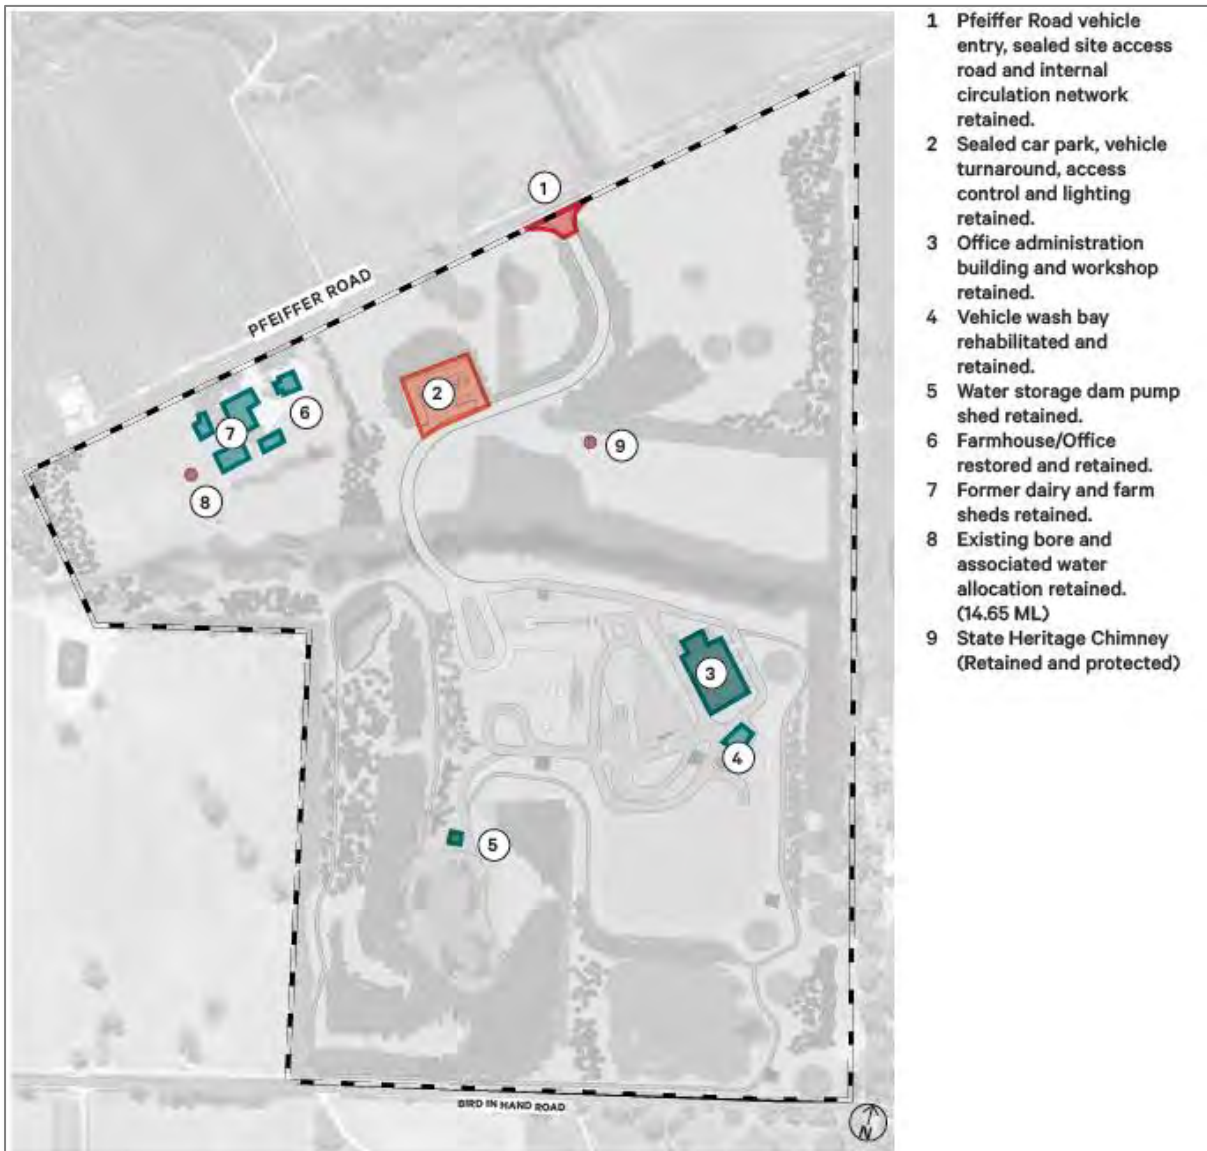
| BUILDINGS AND STRUCTURES TO REMAIN AT MINE COMPLETION (APPENDIX X1)
